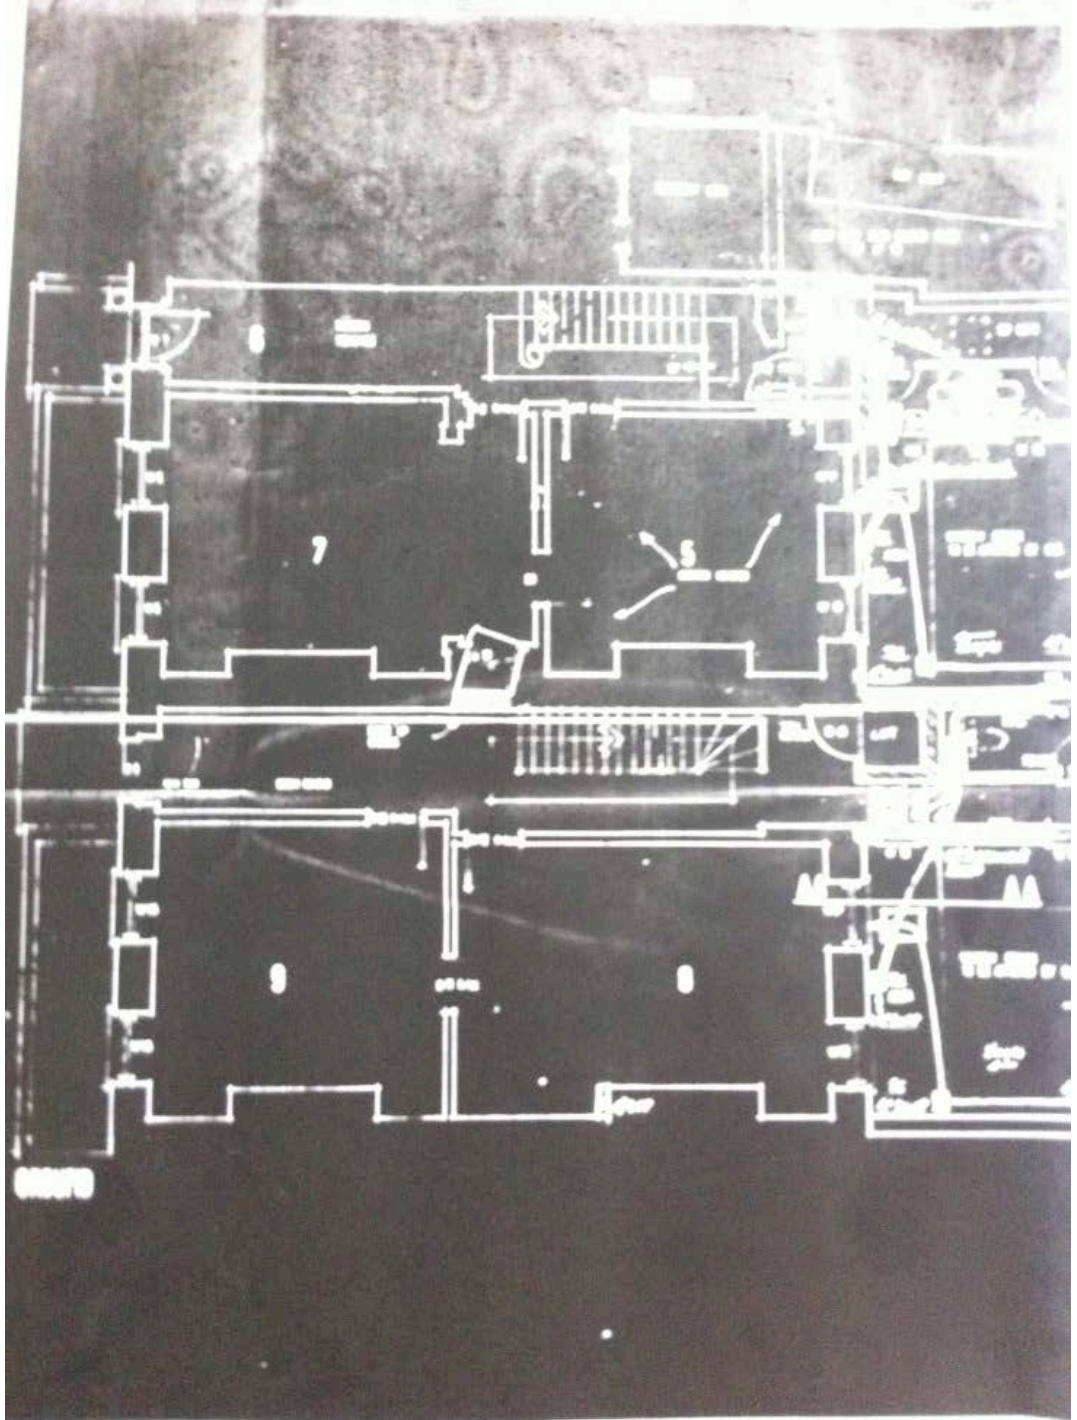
Ground floors plans, 1972 for 14 and 15 Southampton Place (Southampton Place is on the left)
